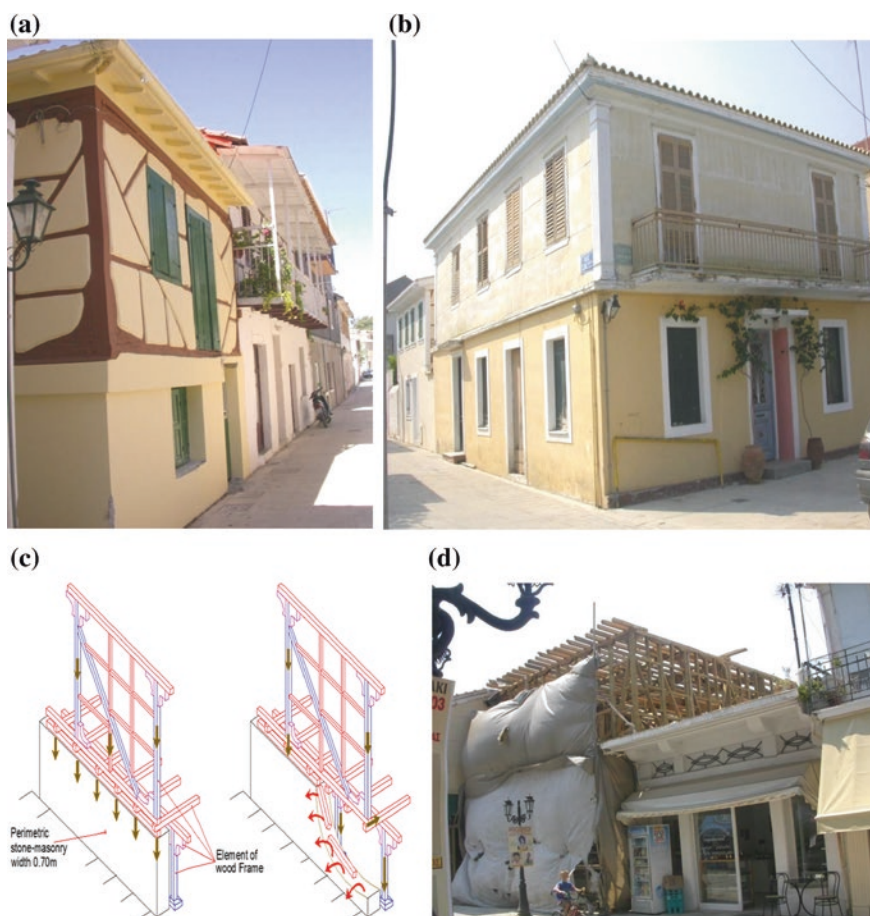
a,b Traditional building with dual bearing system. c The concept of the dual bearing system of the traditional buildings. d The wooden 3D frame of the upper storey
